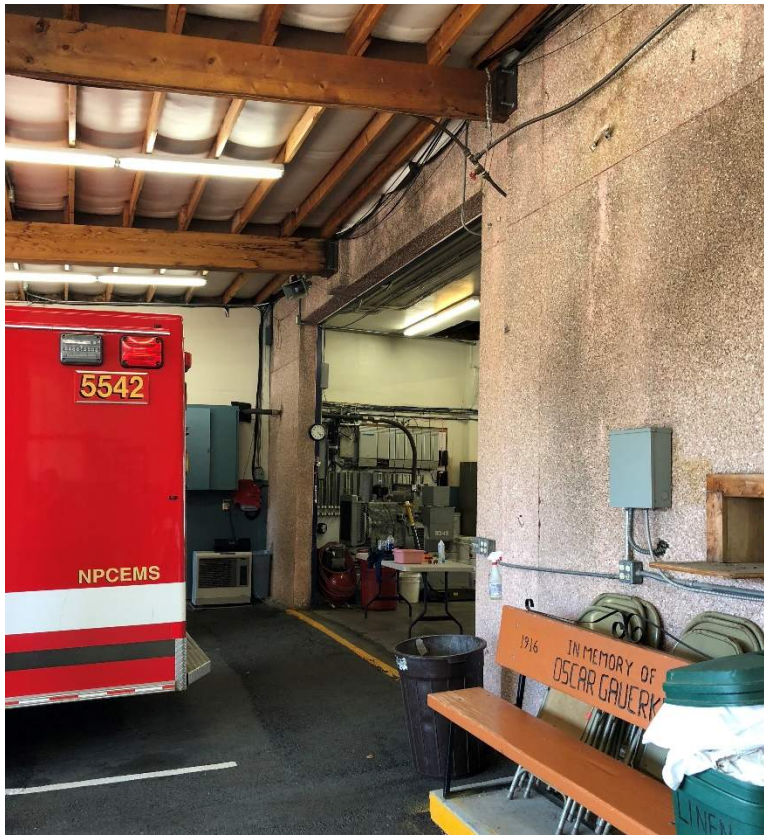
Original South Exterior Wall at Wood-Framed Garage Bay Addition
